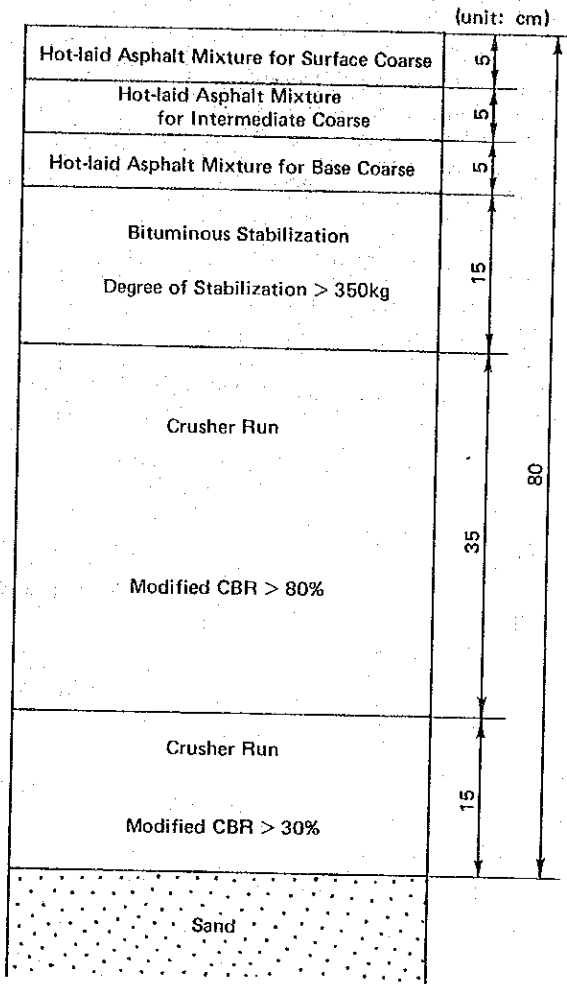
Pavement for the Track of Rubber Tyre Transfer Crane
